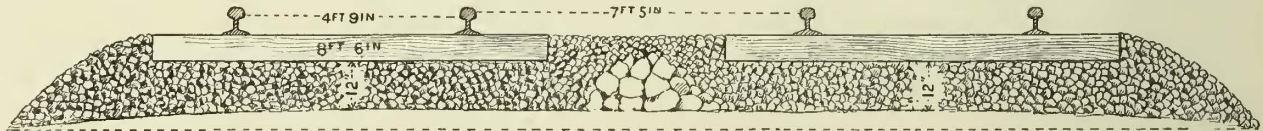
CROSS SECTION OF STEAM RAILWAY CONSTRUCTION WITH STONE BALLAST.
